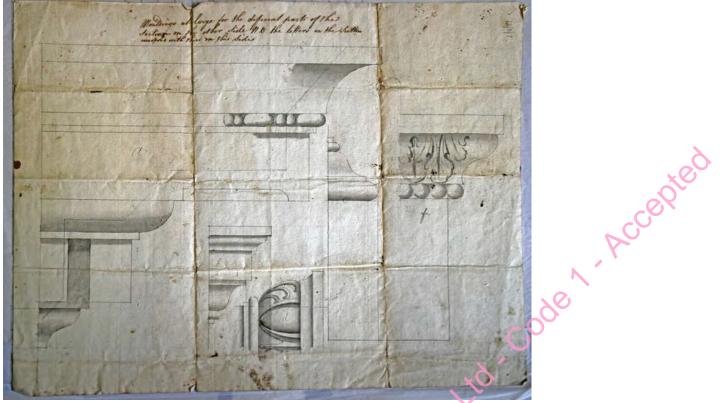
Architectural drawings for the phase of construction at Claydon House held by the archives of the Claydon House Trust (Folder A: 12/2/7)
